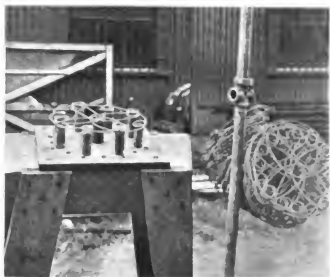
PEGGED TABLE USED IN FABRICATING HOOPS.
